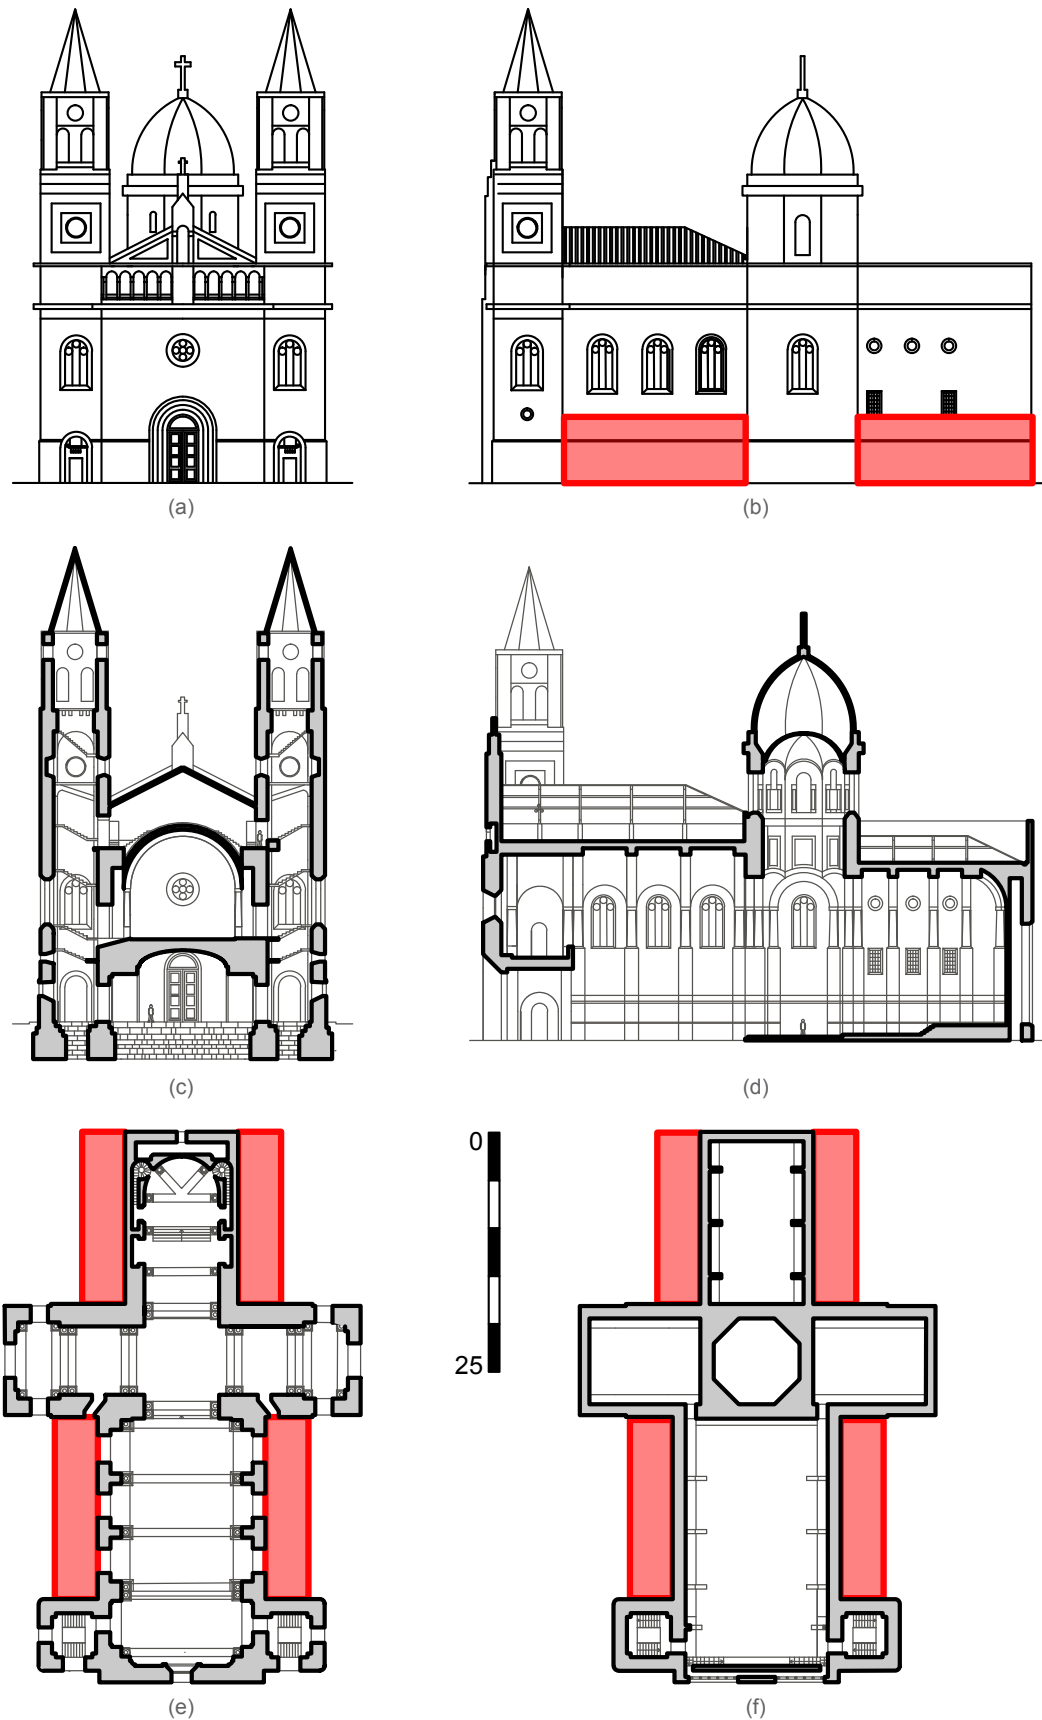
The blueprints resulting from the theodolite scanning, in red are marked the parts omitted during the analysis: (a) façade (b) eastern elevation (c) transversal section (d) longitudinal section (e) ground floor plan (f) roof plan
